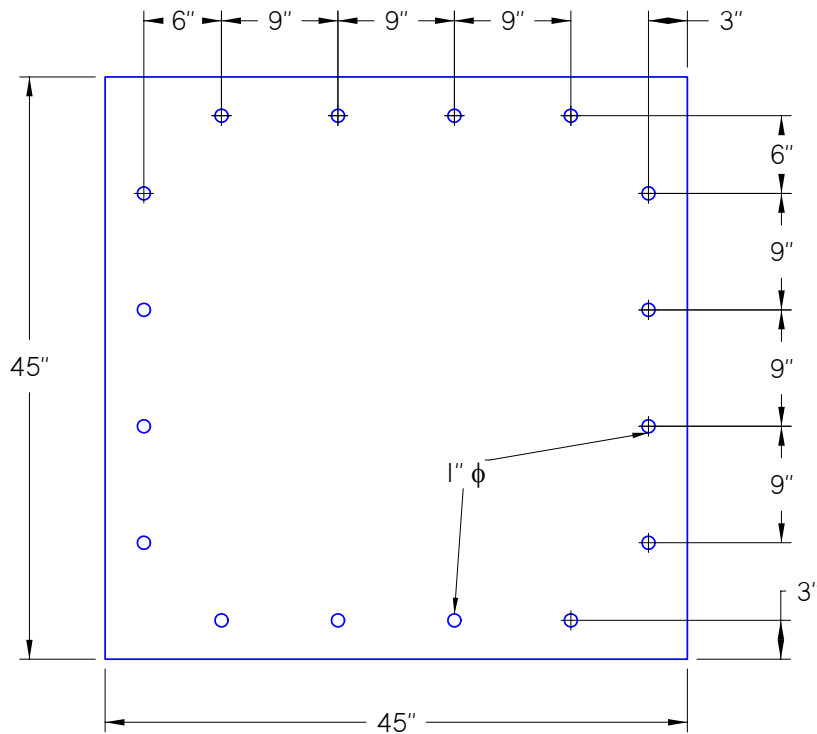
45 in. x 45 in. Slab layout with block-outs
